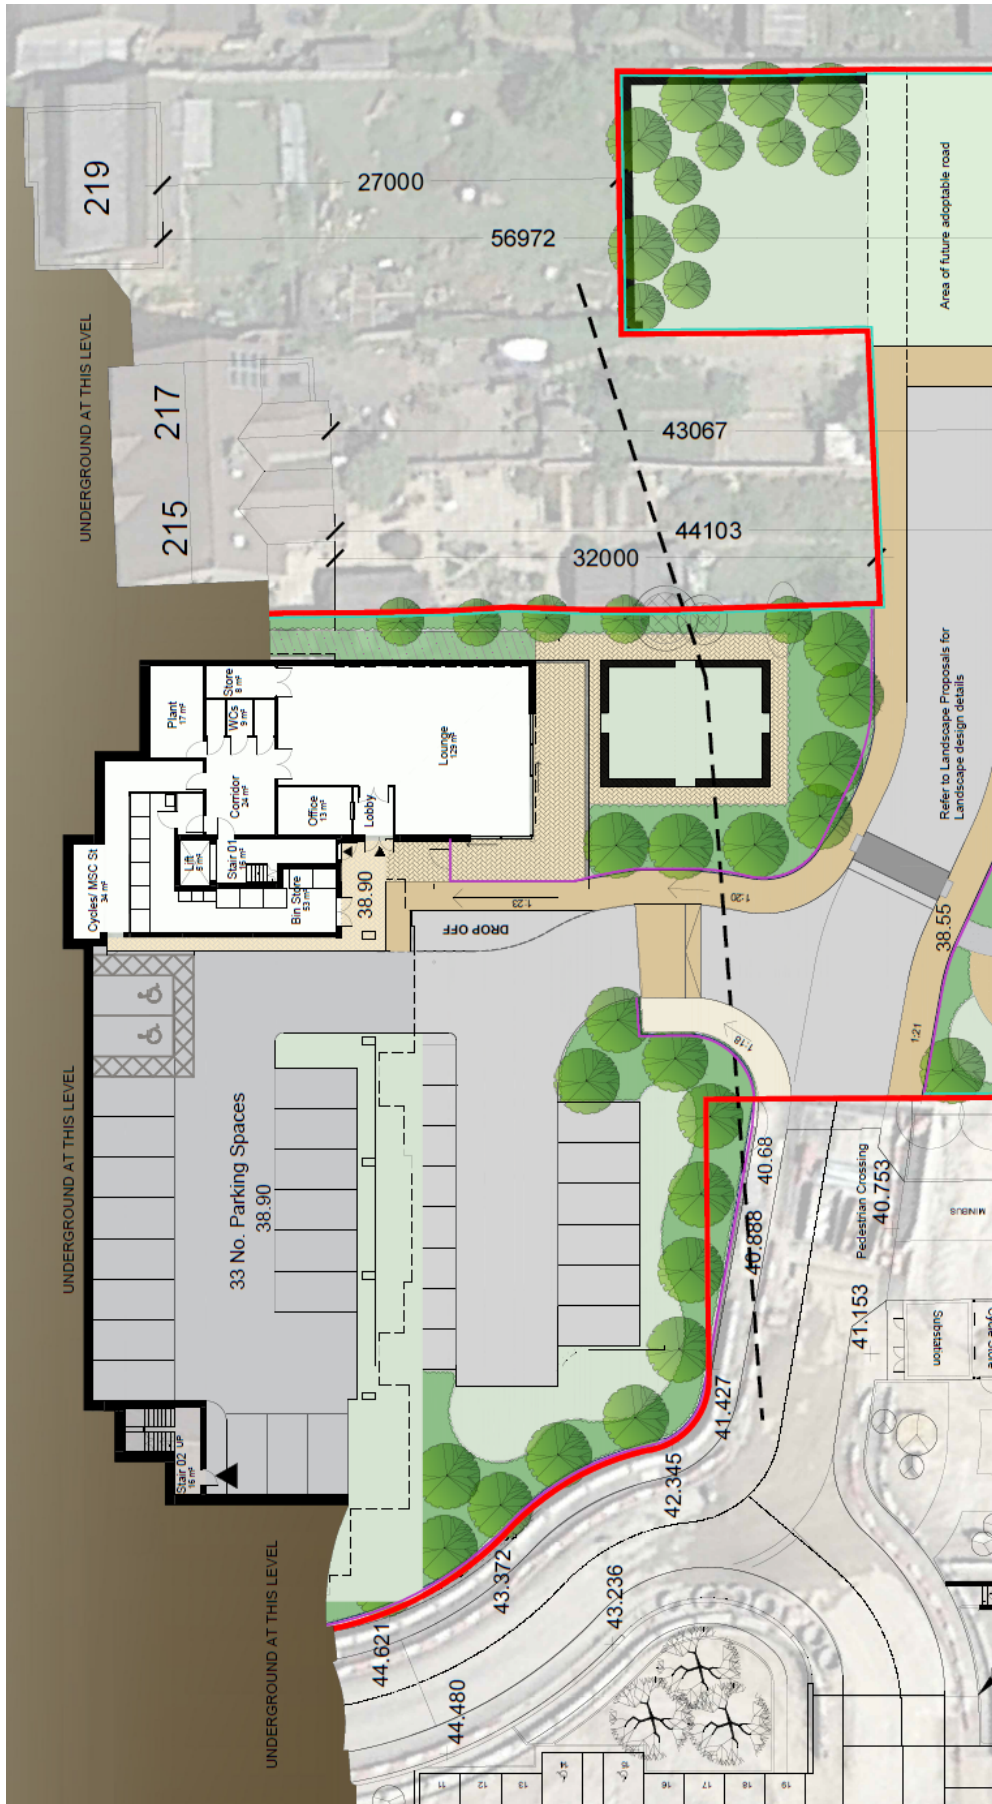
Extract 1 of 2 – The proposed site plan for Block A at car park level (Rev P17)
